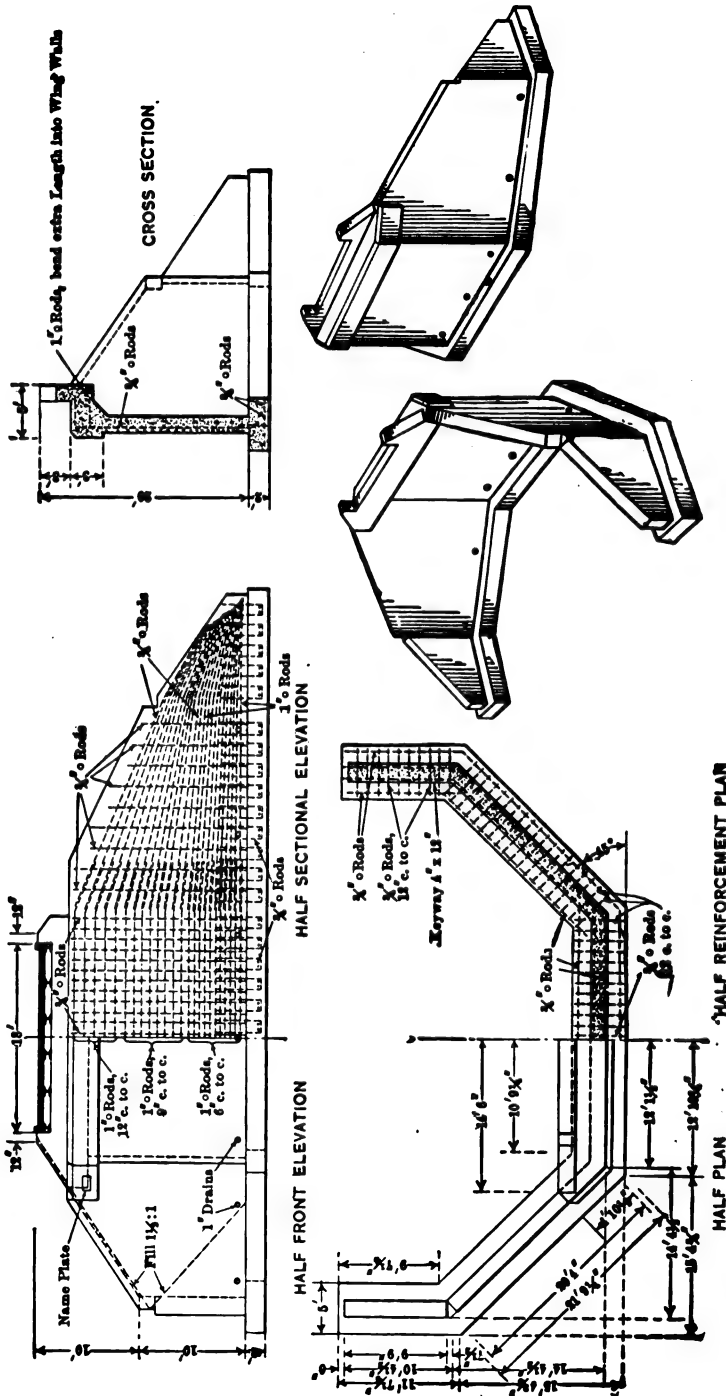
STANDARD REINFORCED CONCRETE ABUTMENT, MICHIGAN STATE HIGHWAY DEPARTMENT.
